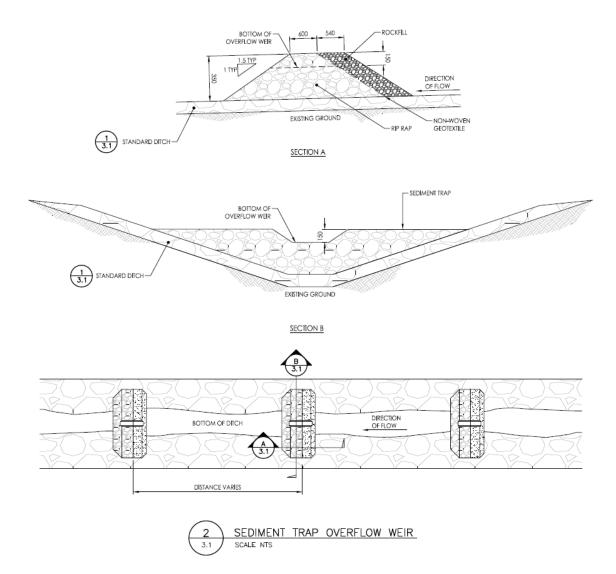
Sediment Trap Overflow Weir Typical Detail
